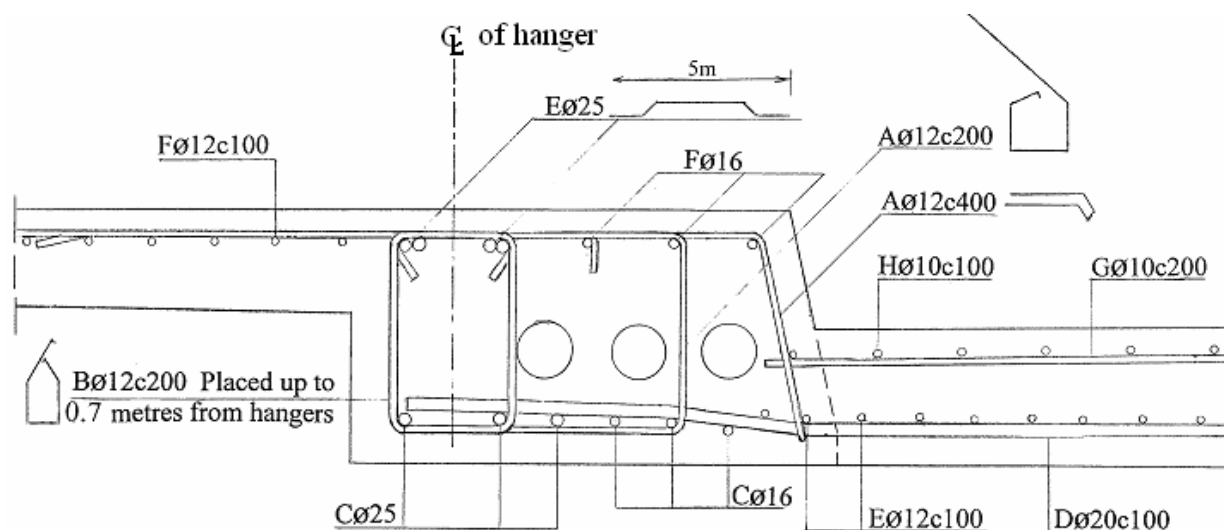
a. Reinforcement in the edge beam nearest to the footpath in the suggested Skodje Bridge.
